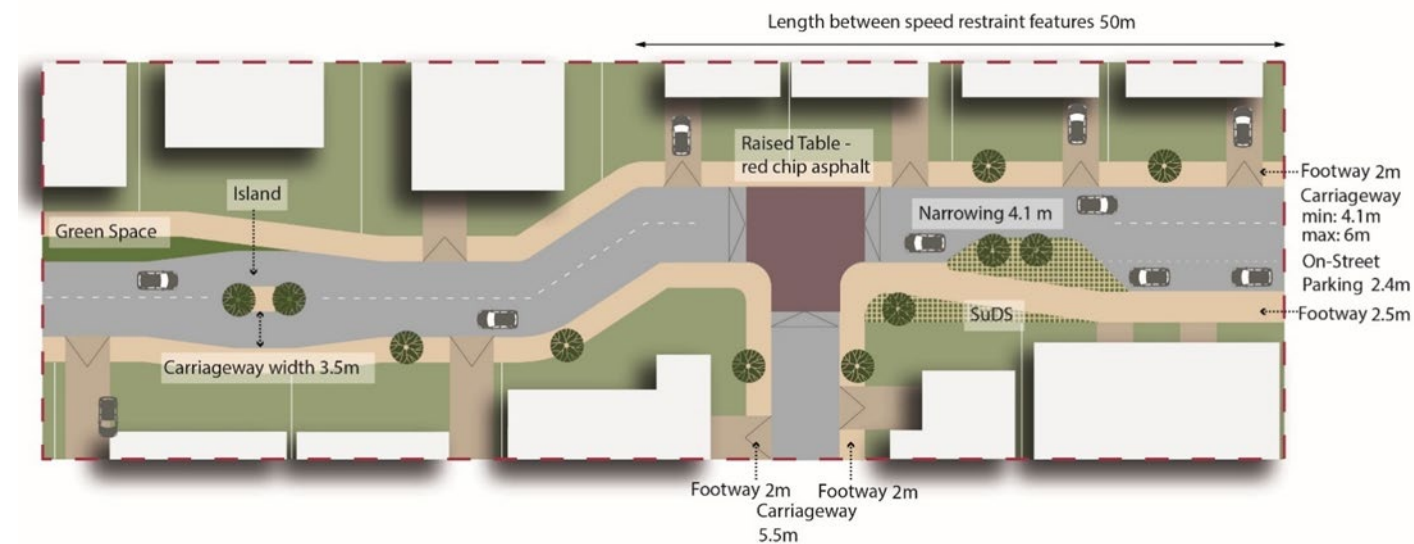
Street Typology Plan for a Residential Connector Street in an Urban Context
